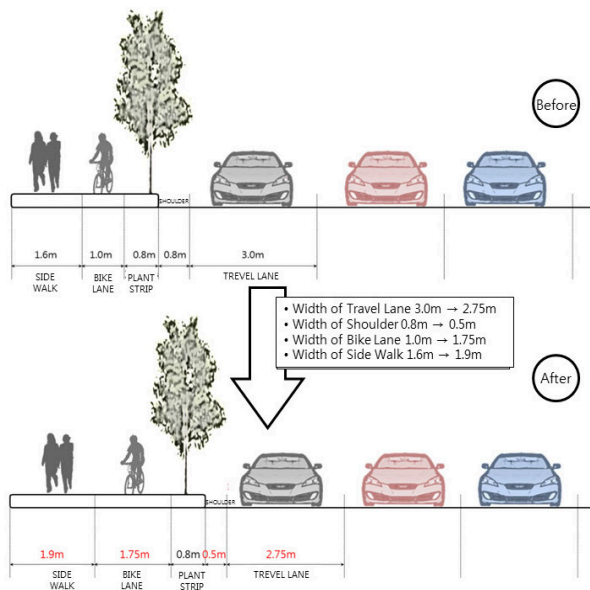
Example of Geometric Road Section After Application of Road Diet
